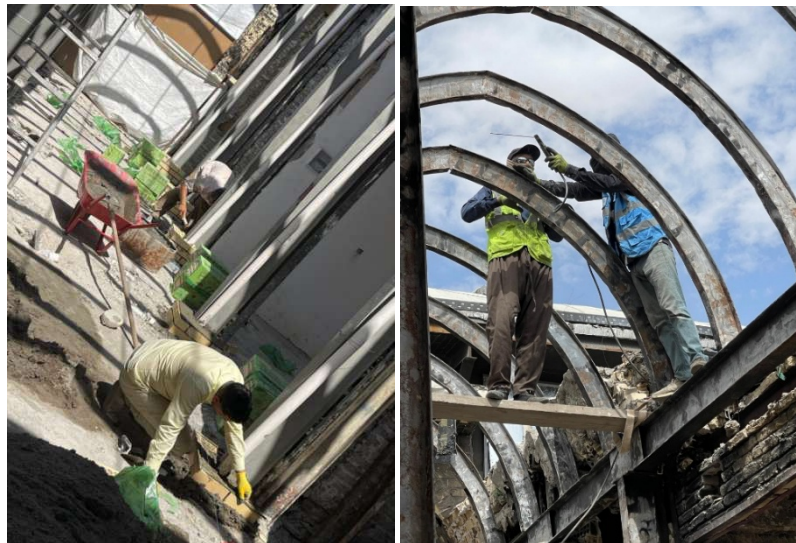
Restoration and Correction of the Floor Levels. Fig. 3: Restoration of the Vaulted Roofing Structure
